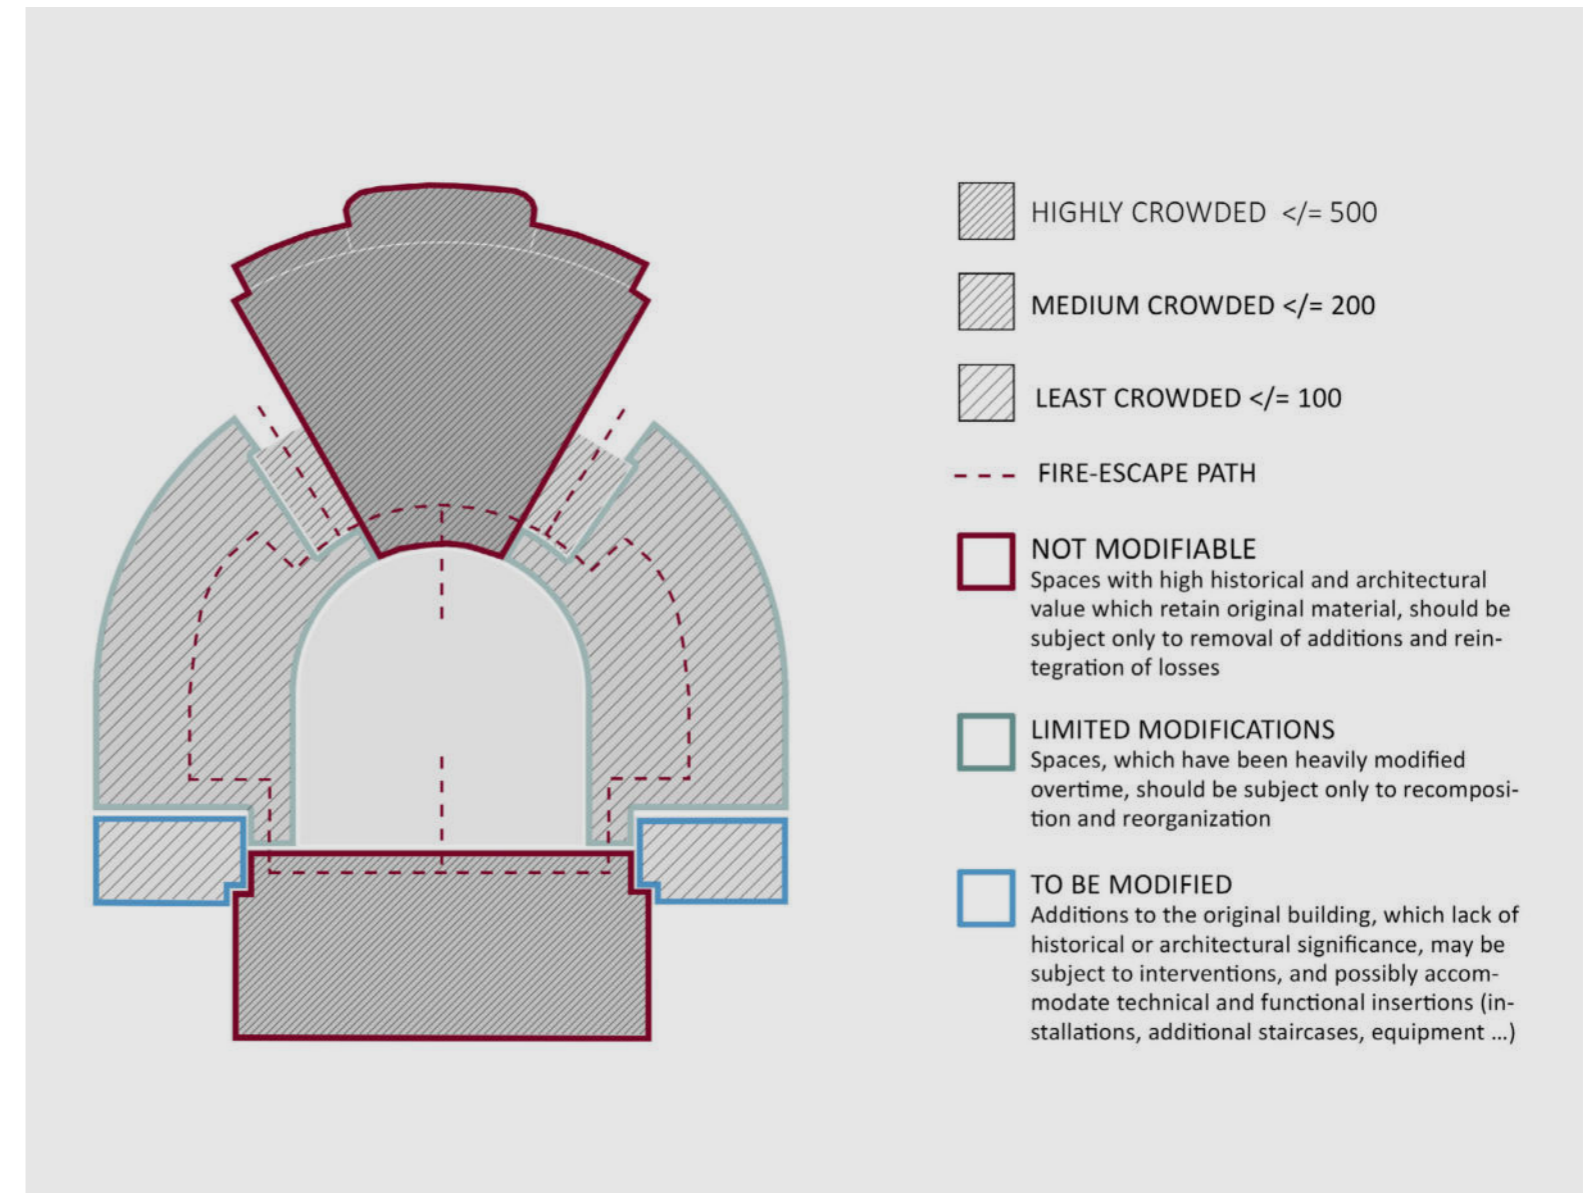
Plan showing the fire escape paths, crowded areas, and level of applicable modifications according to their historical and architectural values (© Salvo 2021)
